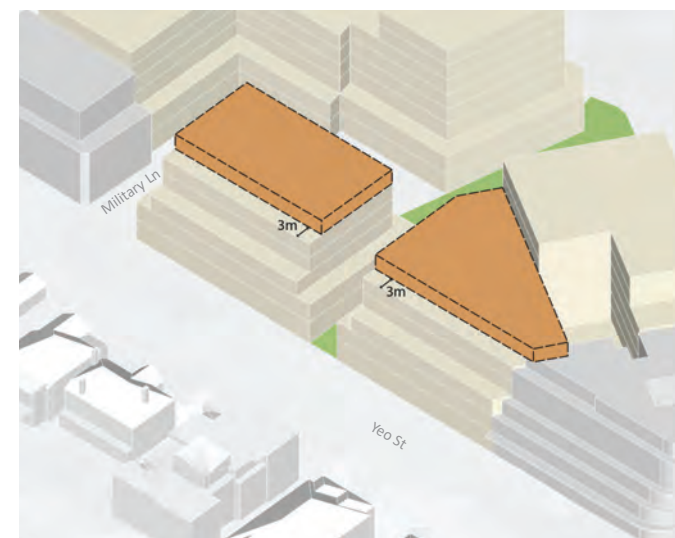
Proposed solar protection control - Yeo Street built form with upper-level setback
